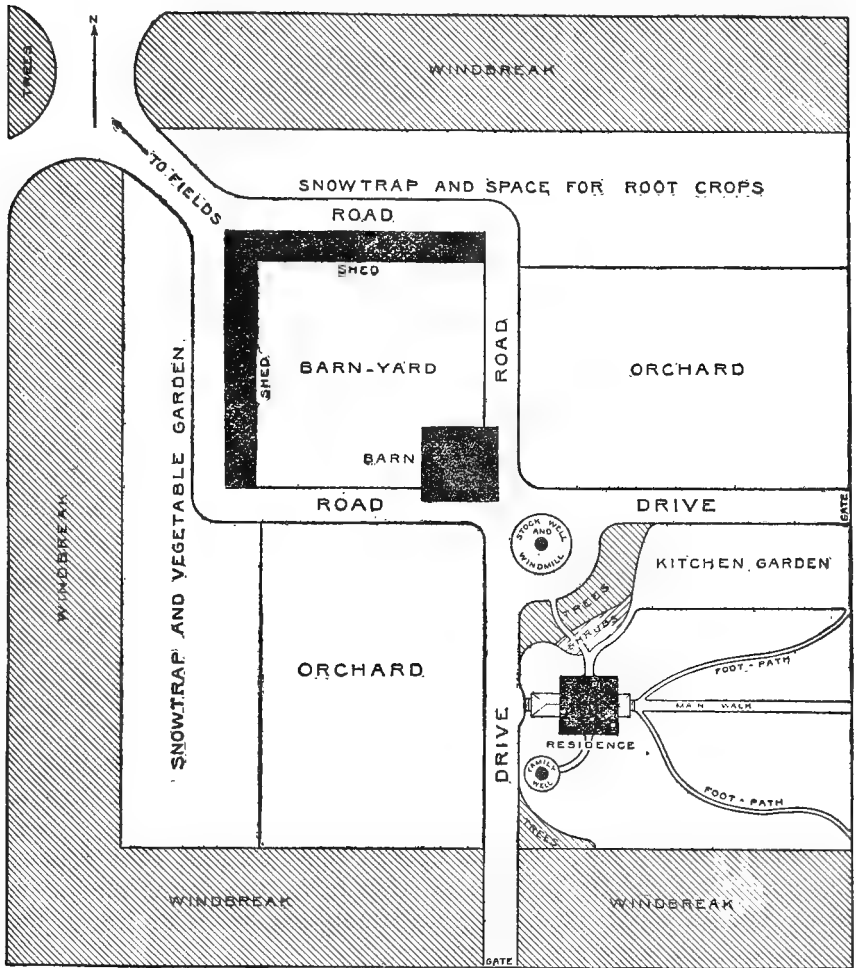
Plan of a farmstead, situated at the southeast corner of a prairie farm, arranged to afford windbreak protection.
